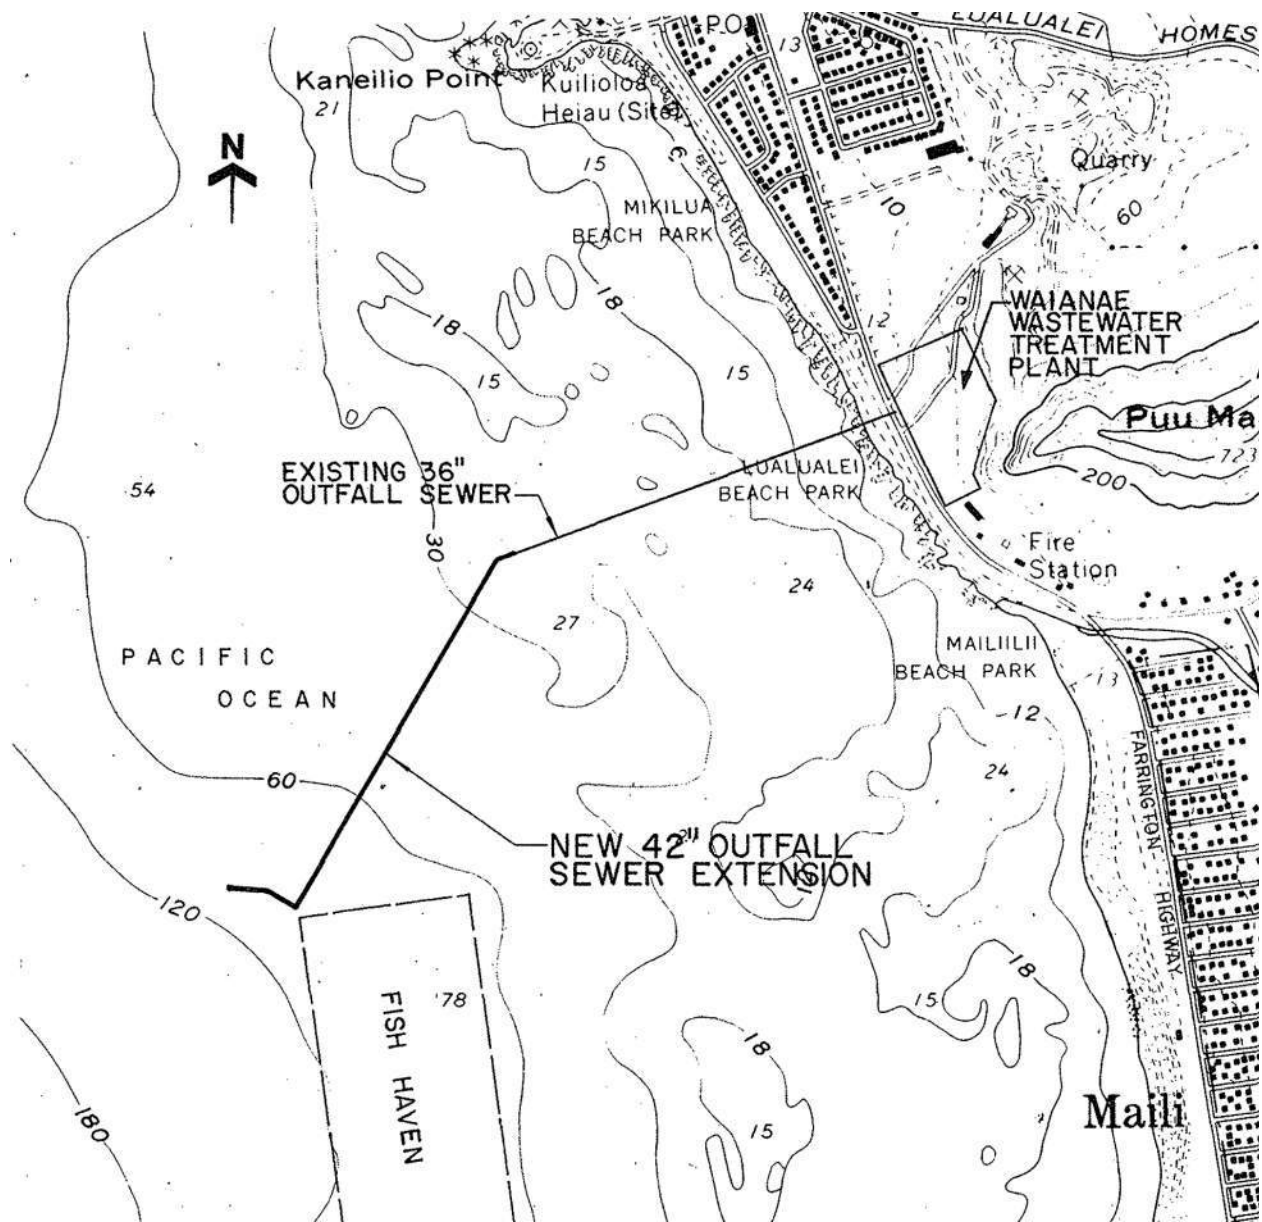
Waianae WWTP ocean outfall plan view, extracted from the as-built construction drawings.
